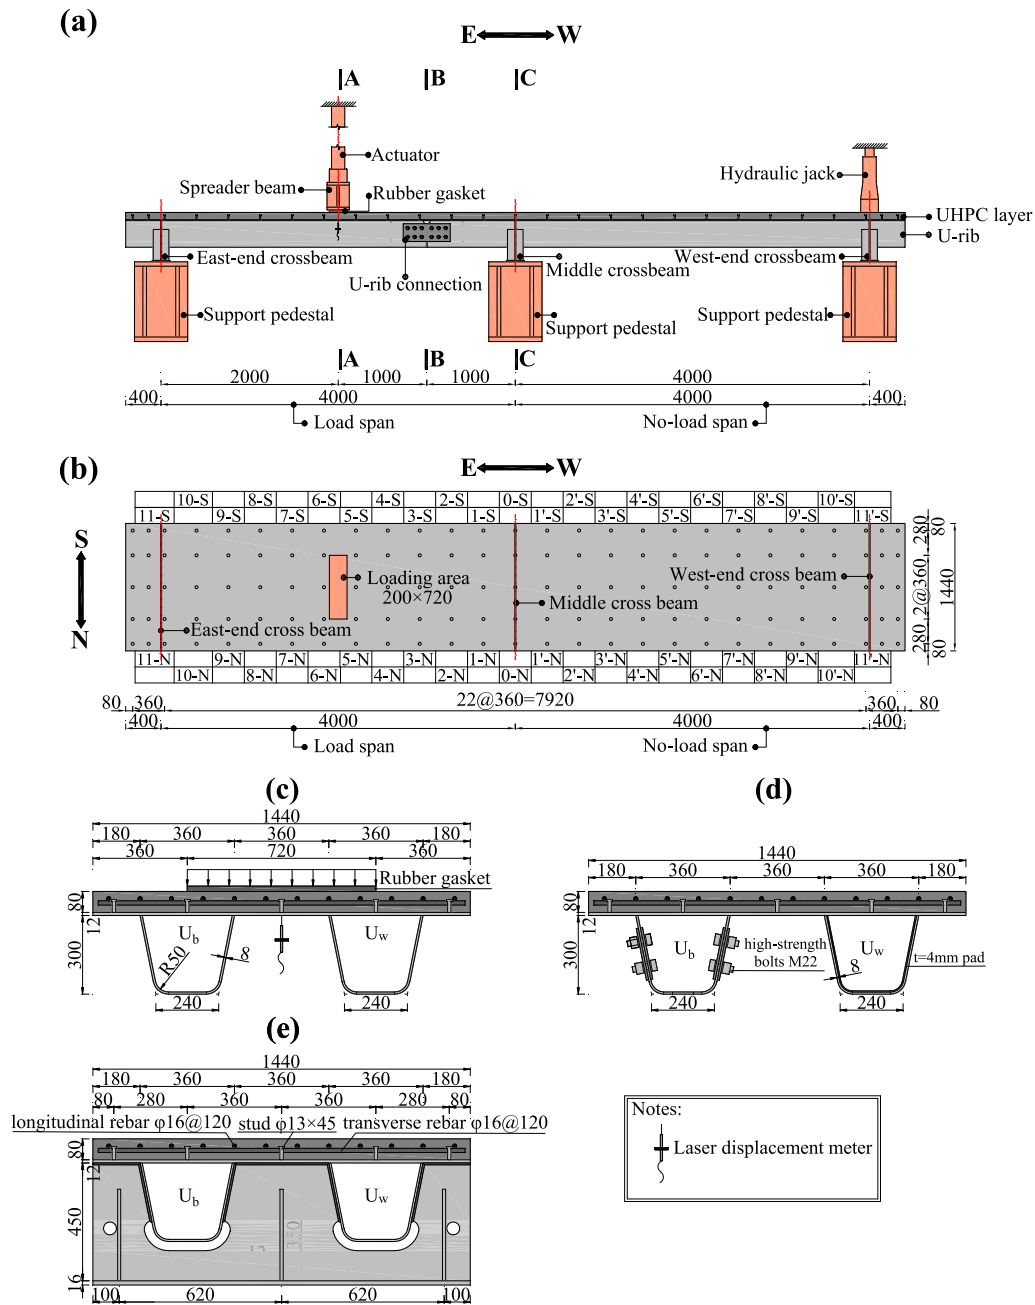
Details of the full-scale specimen (unit: mm): (a) elevation view and setup; (b) arrangement of studs; (c) A-A cross section; (d) B-B cross section; (e) C-C cross section.
